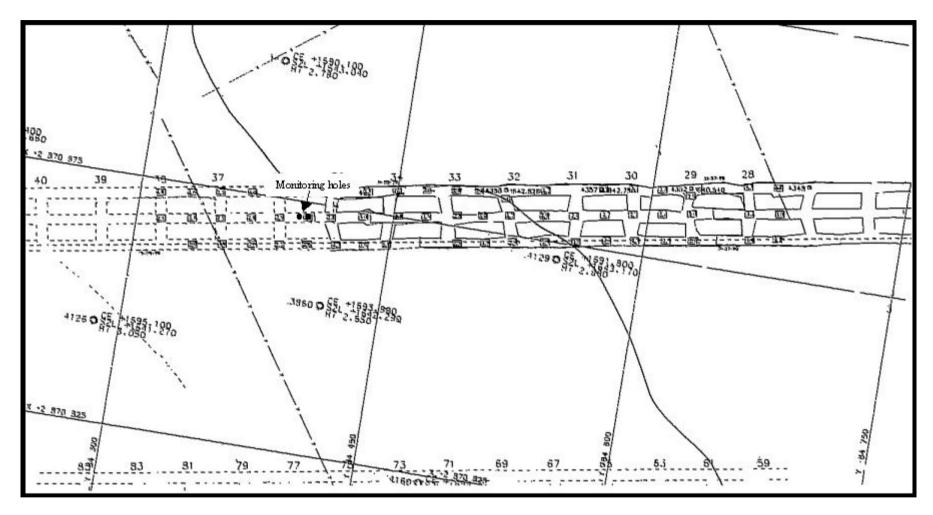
Section plan Colliery 'A' Site 3 (not scaled)
